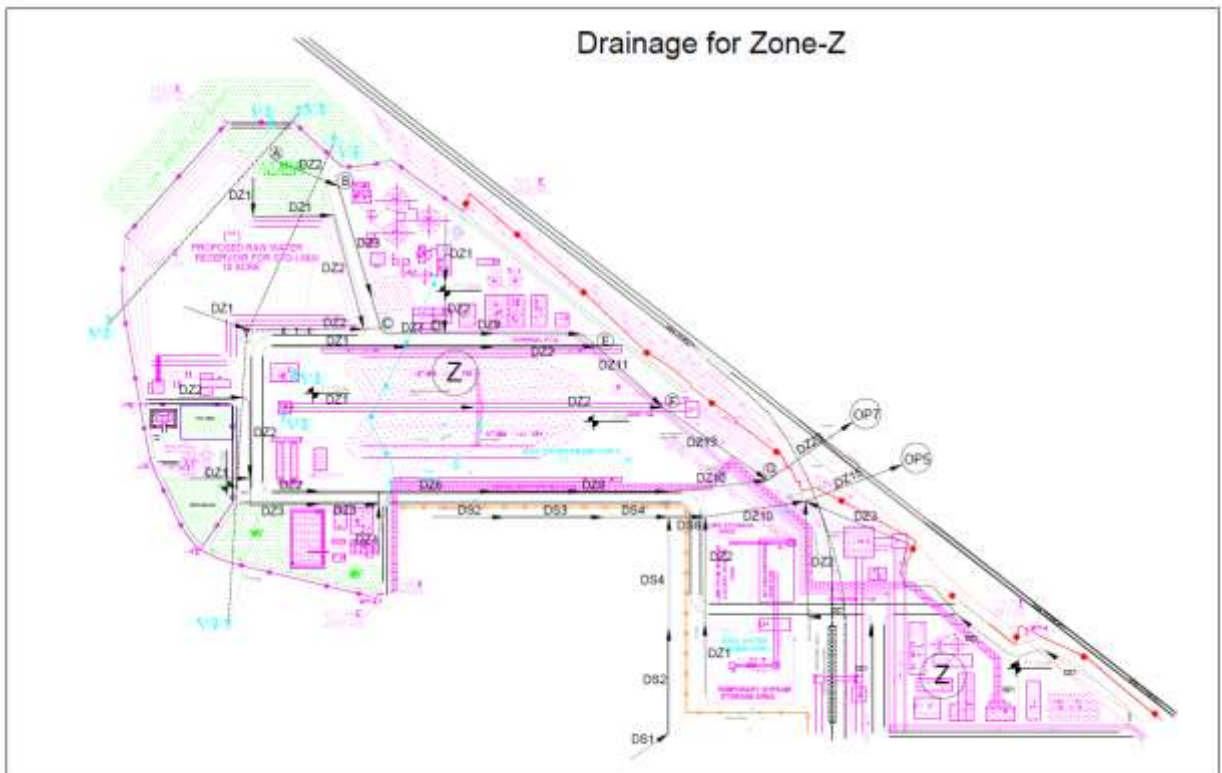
Z Zone drainage plan showing drains, longest flow path and outfall location
